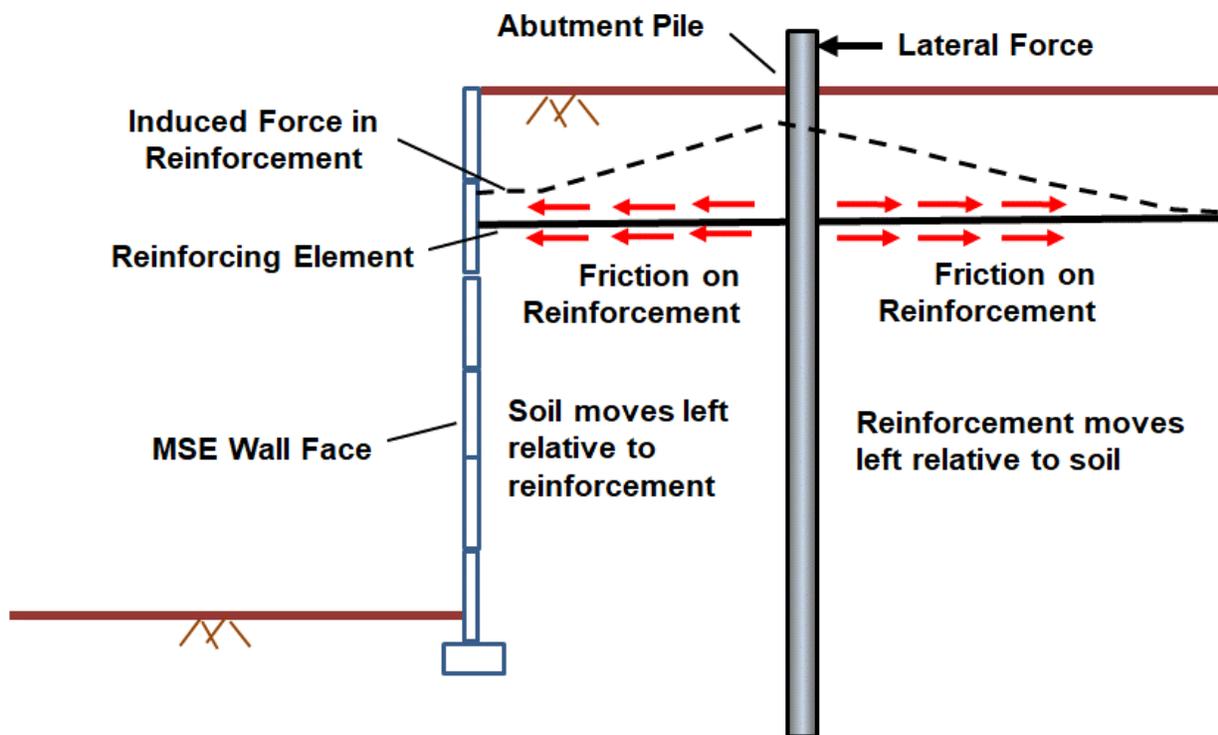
Conceptual illustration of the mechanisms inducing tensile force in the reinforcements from lateral pile loading behind the wall.
